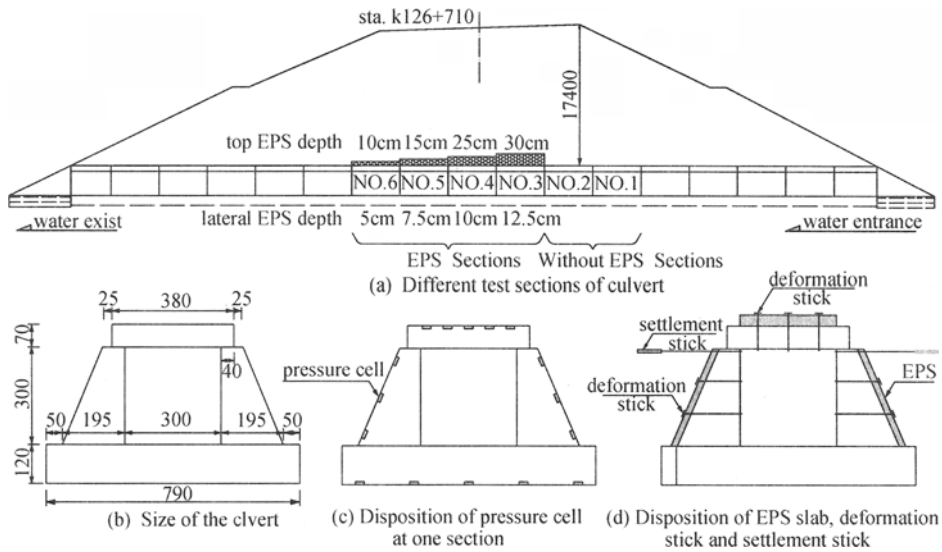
EPS and apparatus disposition in site test(unit: mm)
